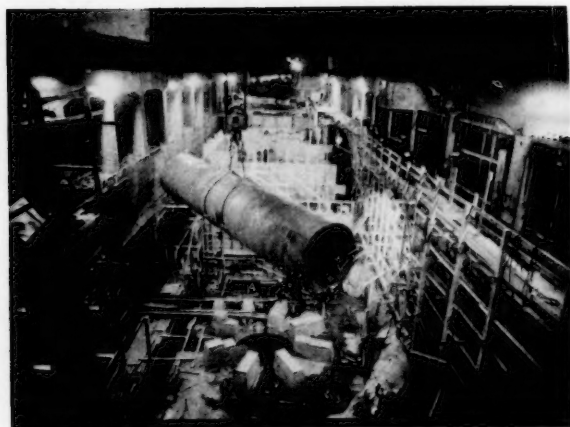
BERSIMIS No.1 SECTION OF STEEL LINER
